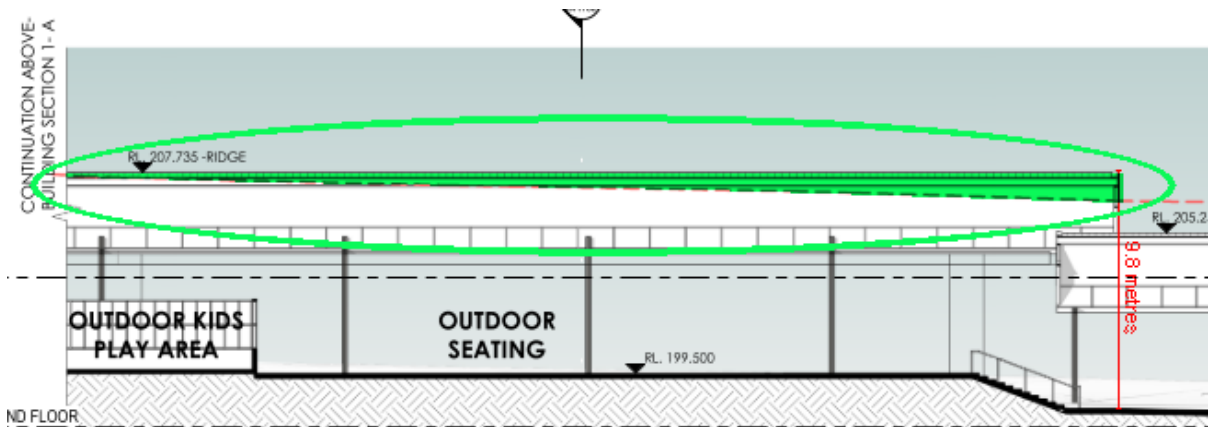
The extent of the building height breach to the roof above the cafe and associated outdoor seating area
